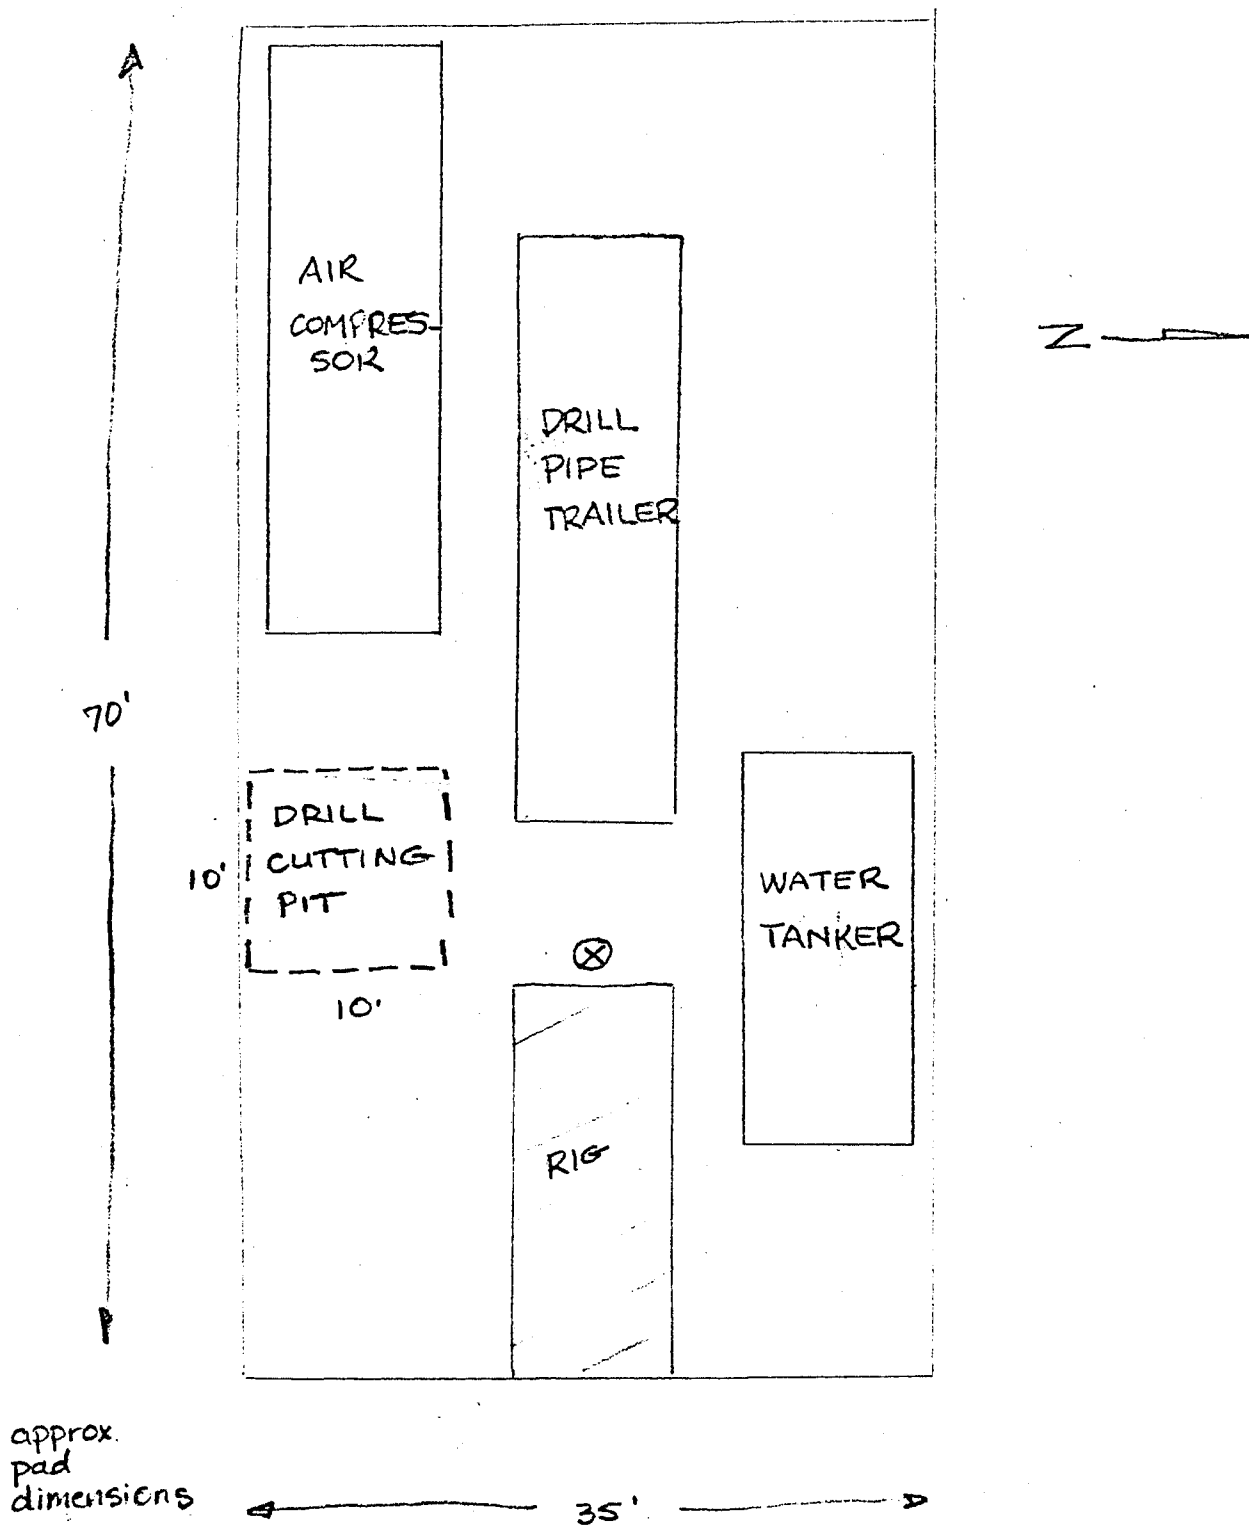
| WELL ACE #1 | DRILLING PAD EQUIPMENT LAYOUT
